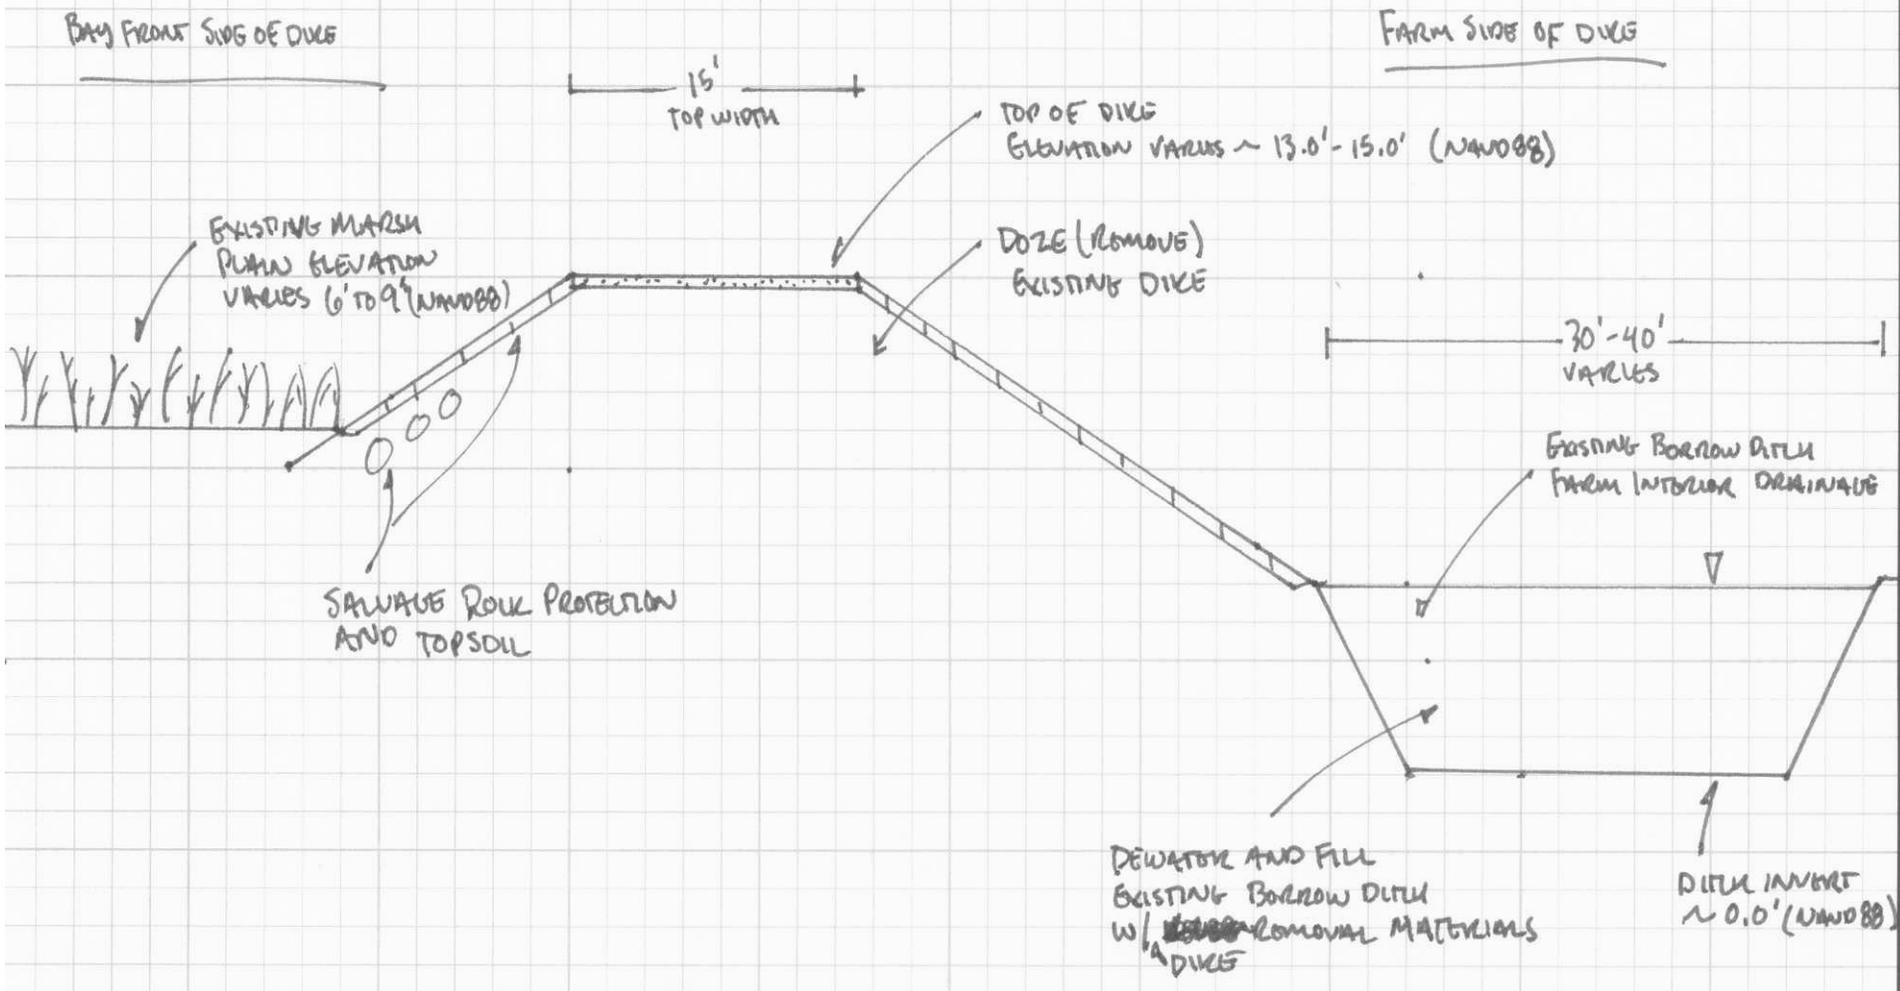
TYPICAL SECTION EXISTING DIKE REMOVAL AND BORROW DITCH FILL.
